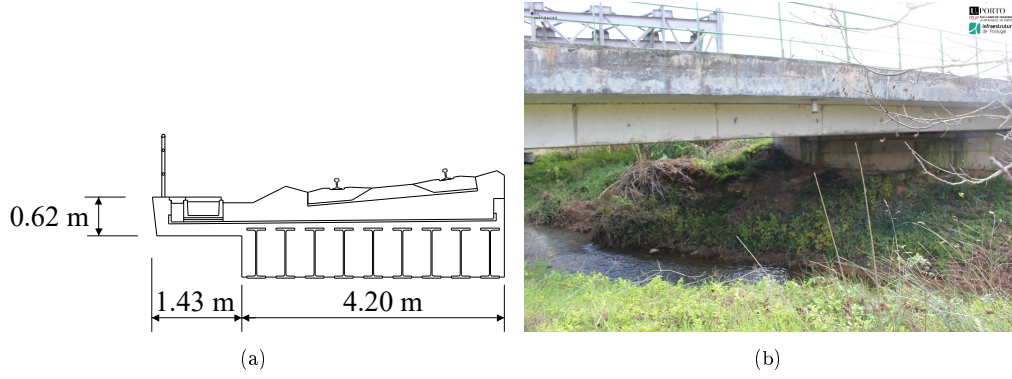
Melga bridge. (a) Cross-section (unit: m); (b) view of the deck.
